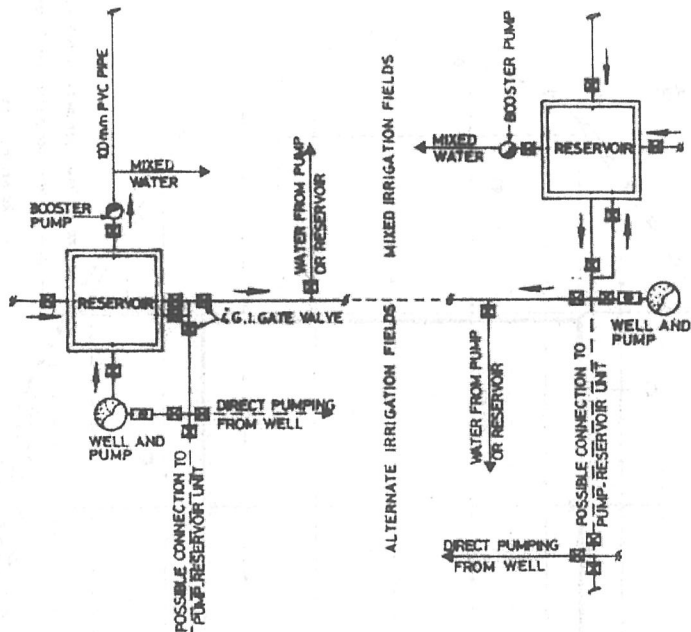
PUMPS-RESERVOIRS CONNECTIONS AND PIPING LAYOUT FOR DIFFERENT WELLS WATER QUALITIES (NTS)
